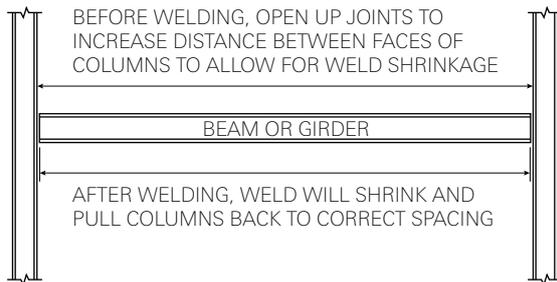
Spreading of columns to allow for weld shrinkage
